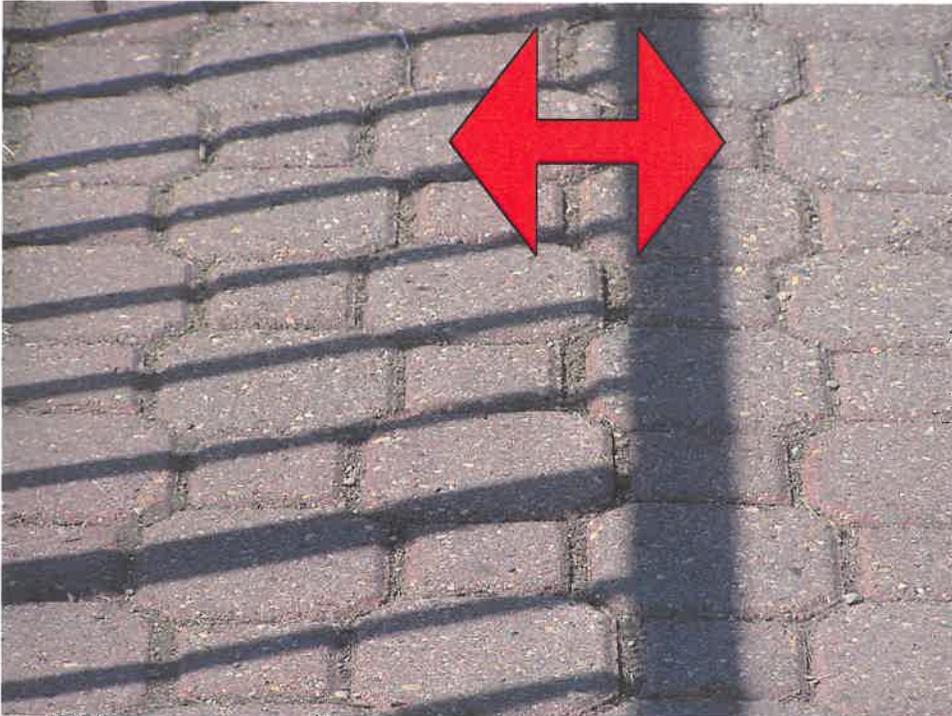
(08/08/2006) - Above the bulge on the brick walkway. The bricks on the right (upstream) side are tightly packed and generally flat. The bricks on the left (downstream) side have a slight dip in the downstream direction. Note the joint in the bricks between the arrows and the change in joint size and material in the joint. Compare to the flush bricks on the right with some soil on the beveled edge. The bricks on the right are stable while the bricks on the left indicate a creep in the downstream direction
